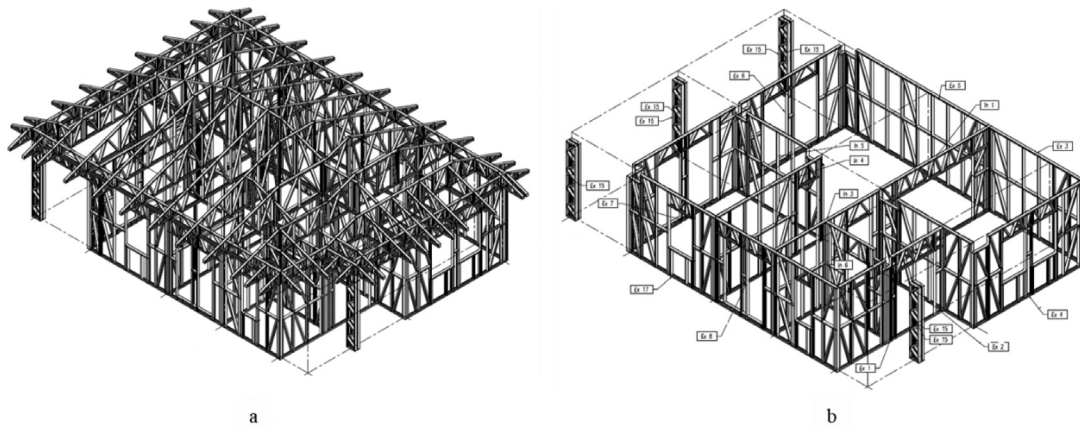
Axonometry of typical one storey structural systems made of TWS profiles C89x41x12x1: (a) general assembly; (b) wall panel system.
